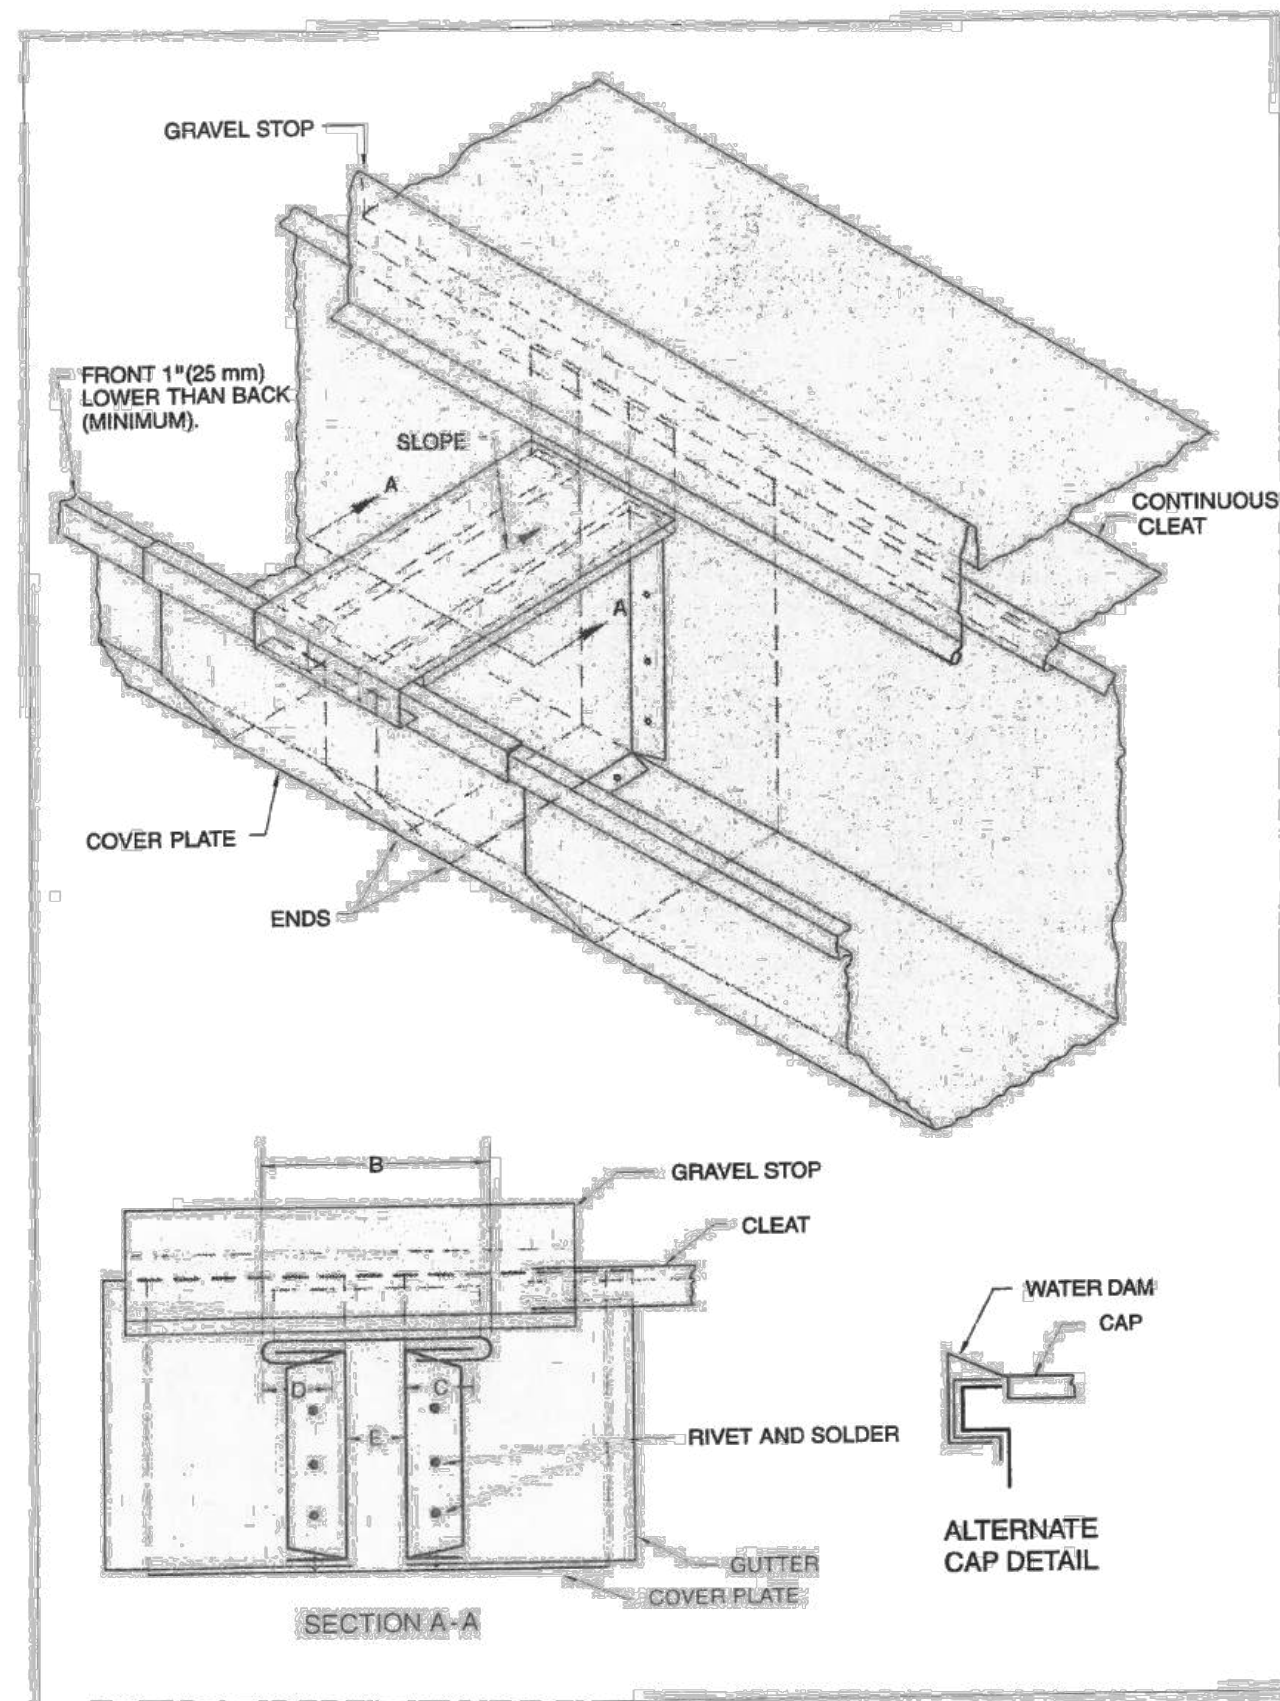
BUTT TYPE GUTTER EXPANSION JOINT
